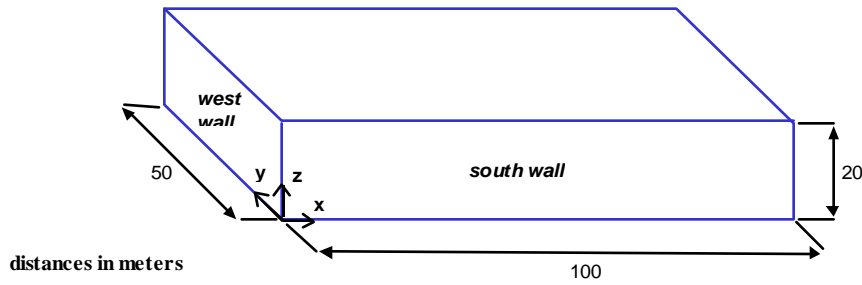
Building Geometry for BE No. 2, Part II – External Dimensions
